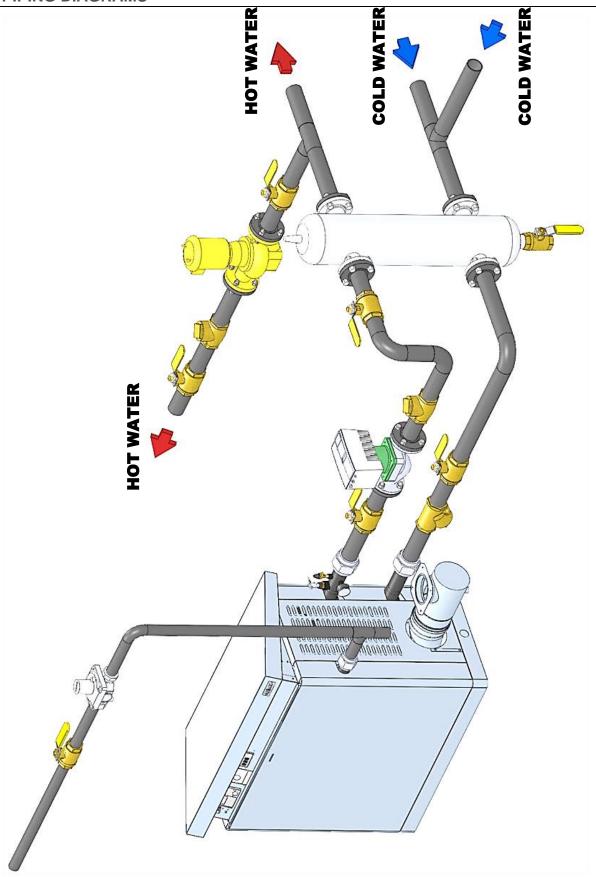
Modulex EXT Single Boiler Installation with Hydraulic Separator and DWH Installed
